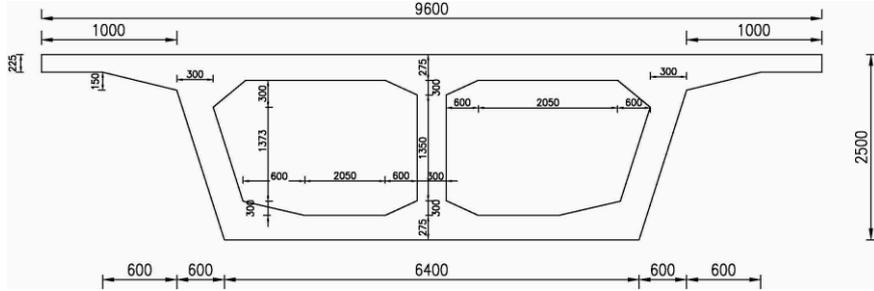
Geometry and dimension detail of the deck (all dimensions in mm)
